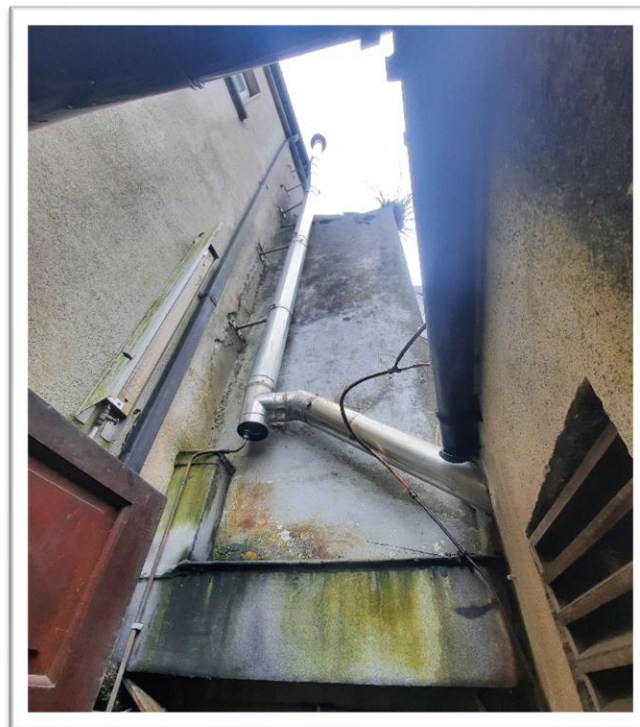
Externally mounted supply pipes to central heating and stainless steel flue.
